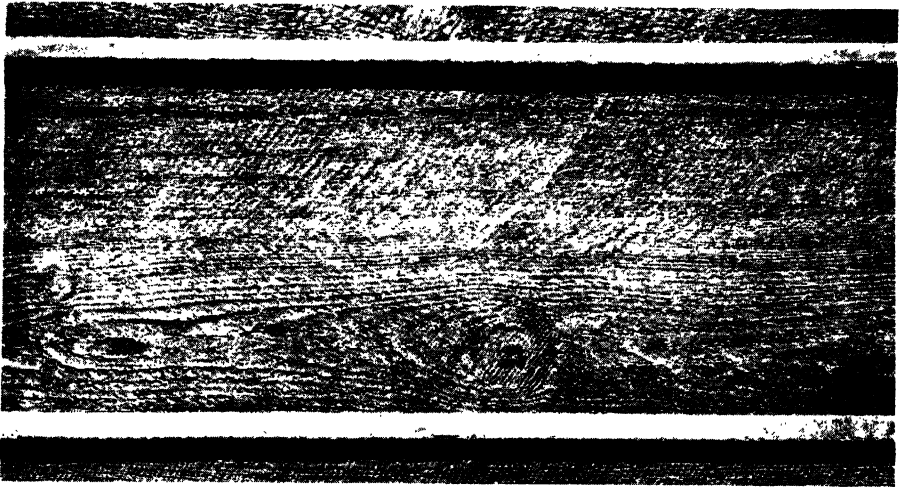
RIBBED CONCRETE SURFACE SHOWING THE GRAIN OF WOODEN SHUTTER BOARDS AND RESEMBLING PETRIFIED TIMBER.
